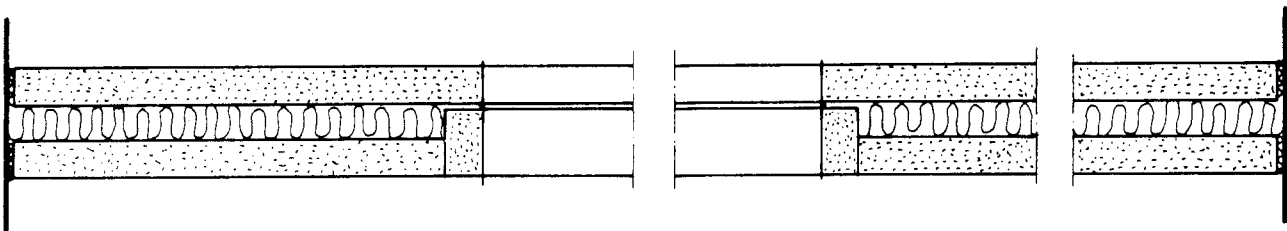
Horizontal section of the lightweight concrete wall with test opening
